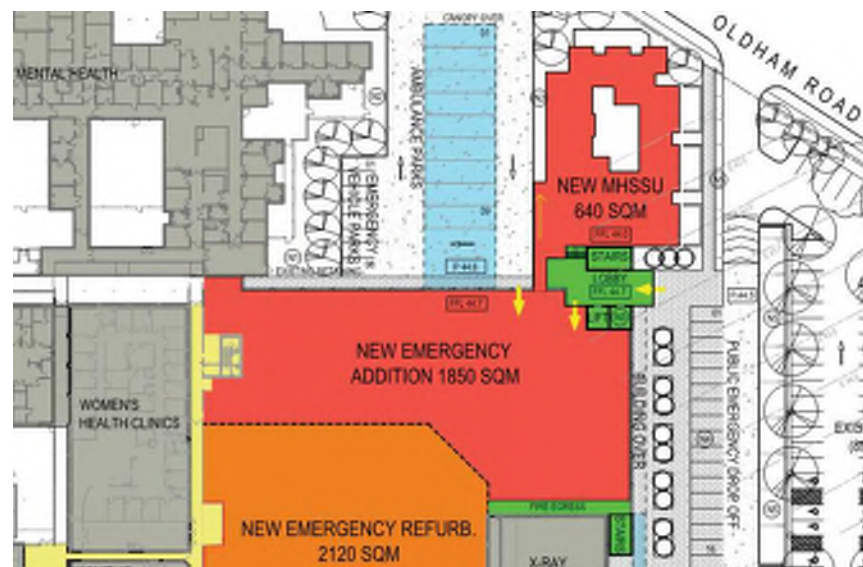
Concept Floor Plan – Ground Floor. NB – assessment based on new additions only (in red).
